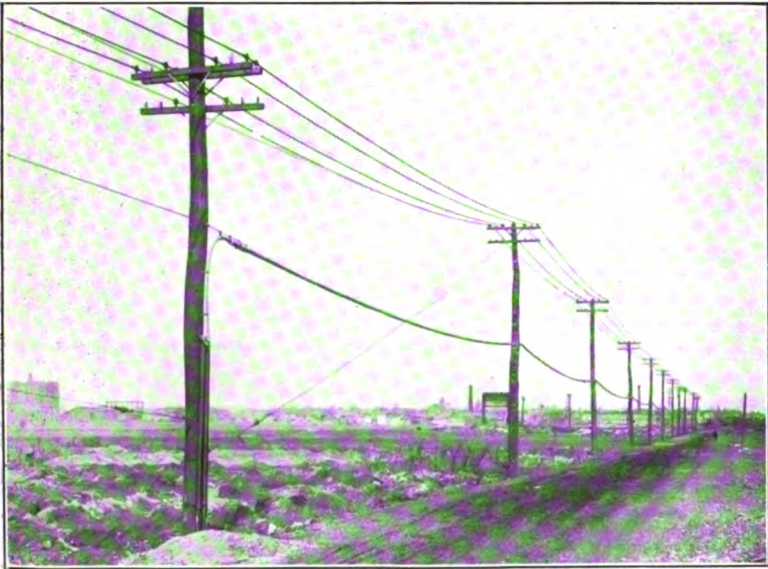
26,000-VOLT AERIAL CABLE INSTALLATION [MEYER]
